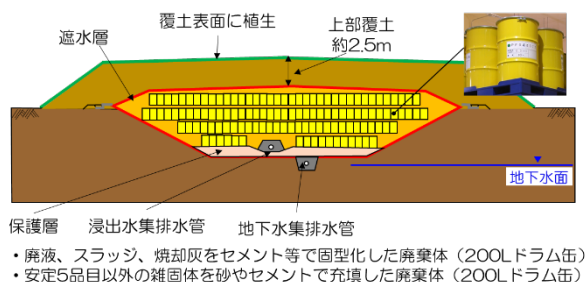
Conceptual view of trench disposal facility equipped with impermeable layers[1, 2]
